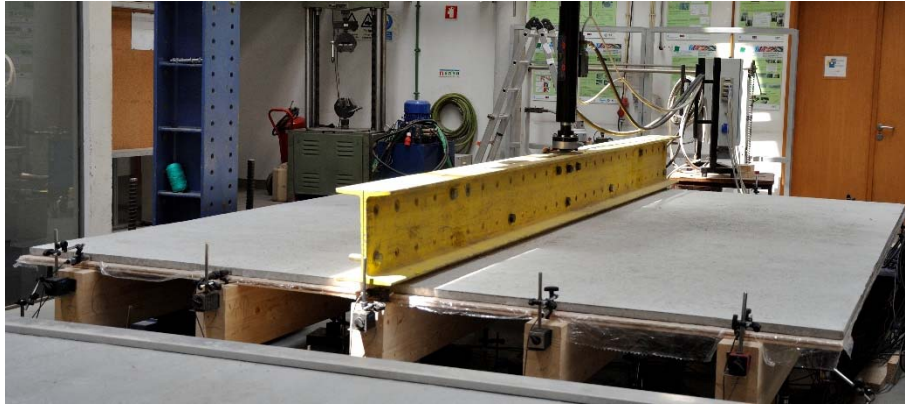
Test setup: line load at a 4.00 m span specimen (S3-hc=0.03m)
